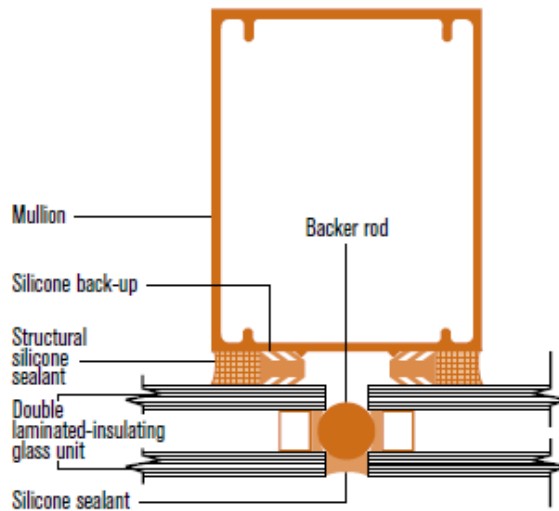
Typical Structural Silicone Glazing System with Double Laminated-Insulating Glass (SAFLEX, 2007)
